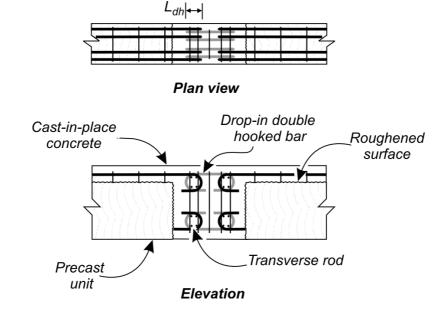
Beam-to-beam connection using drop-in double hooked bars
